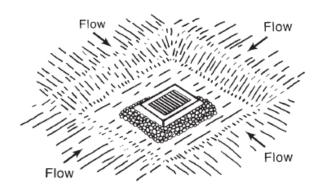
Excavated Inlet Protection (Source: NCDENR)
